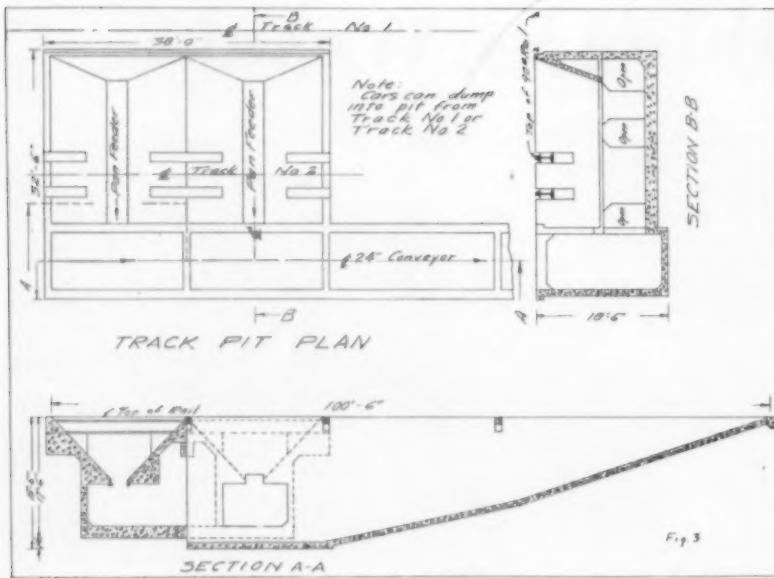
Track pit plan of dry-cleaning and sizing plant received stockpiling material from air-dump cars
